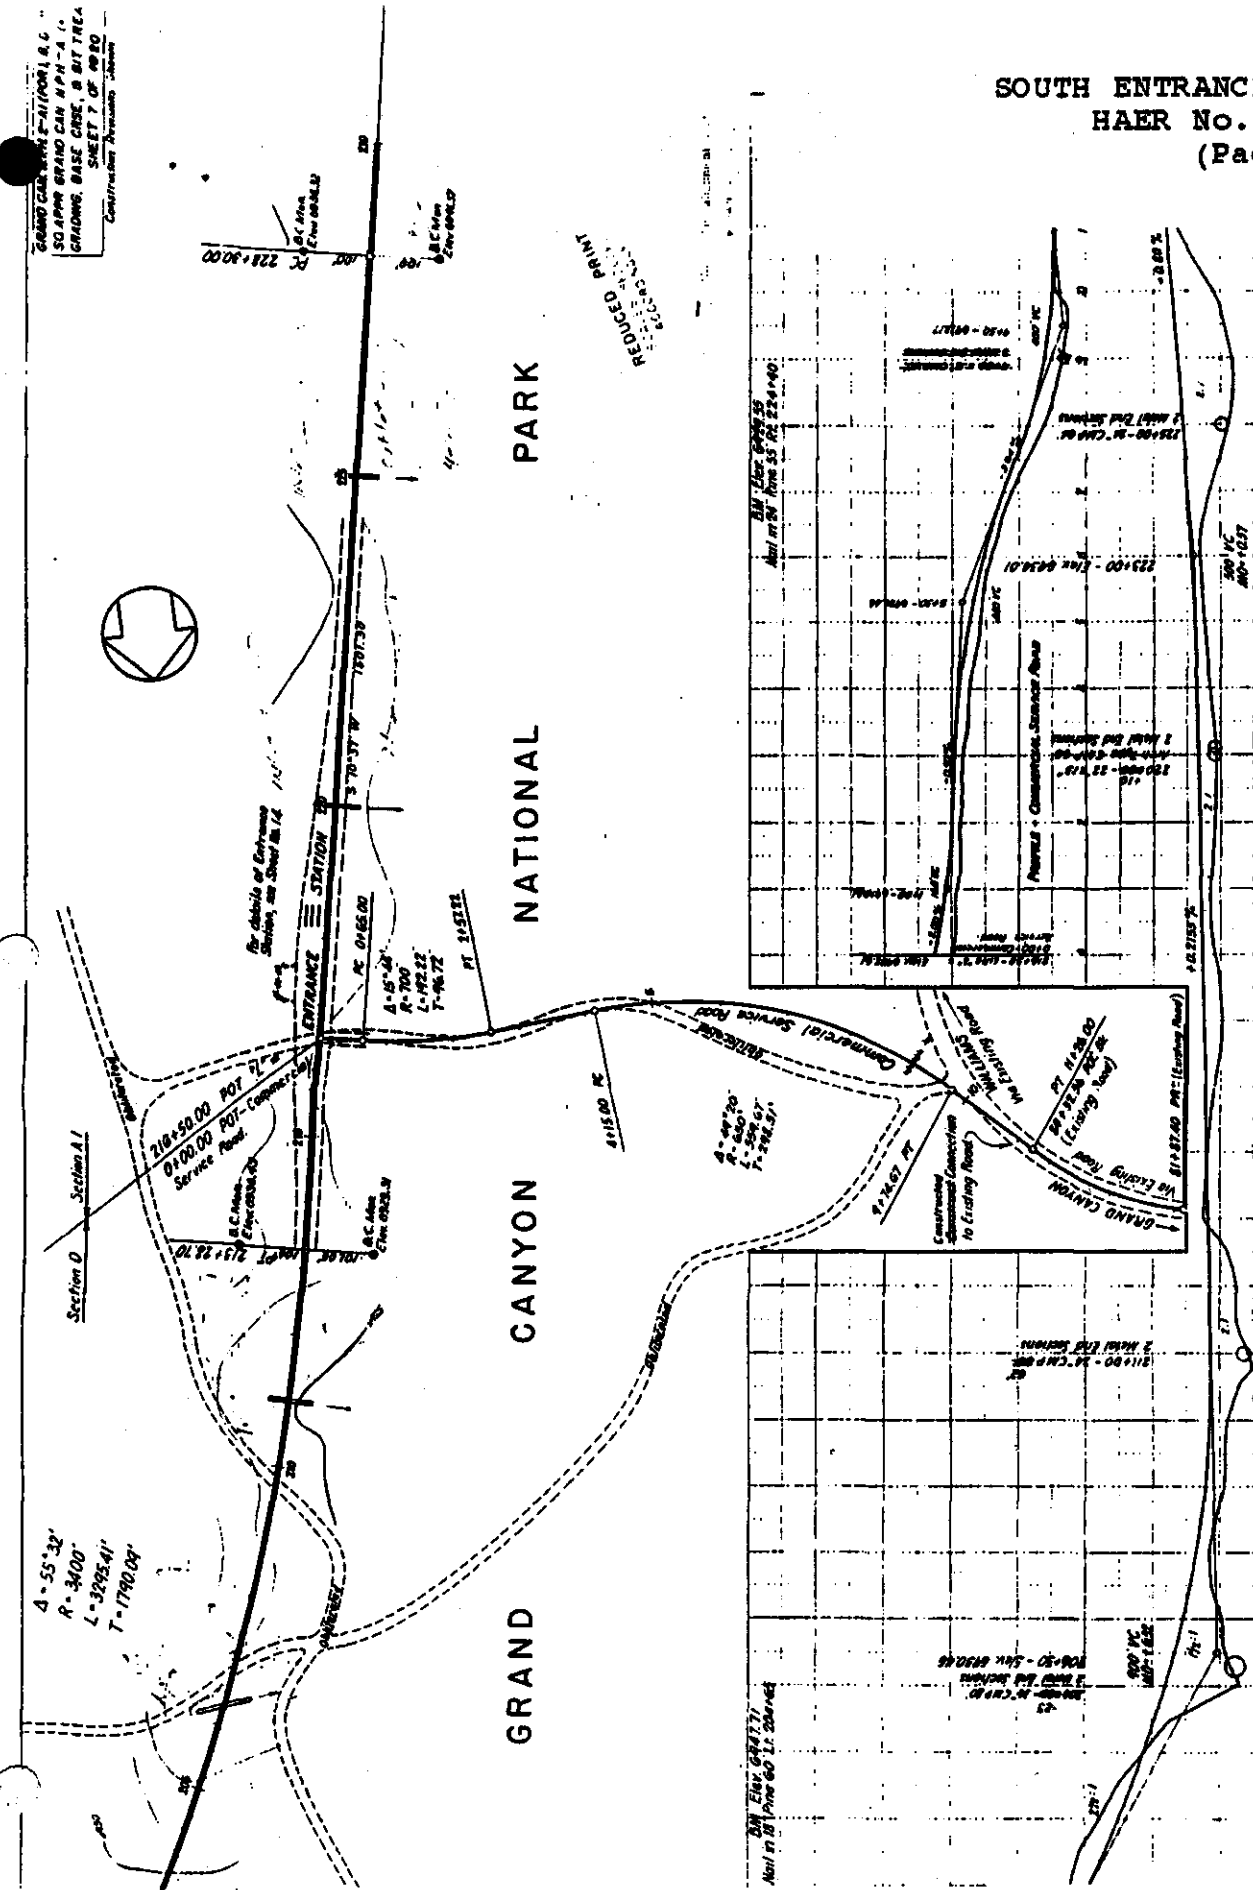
New South Entrance Road at today's intersection with Center Road, 1954. Note the new entrance station location, old roads obliterated, and extension of Center Road. (From As Constructed Drawings, Sheet 7 of 20)
